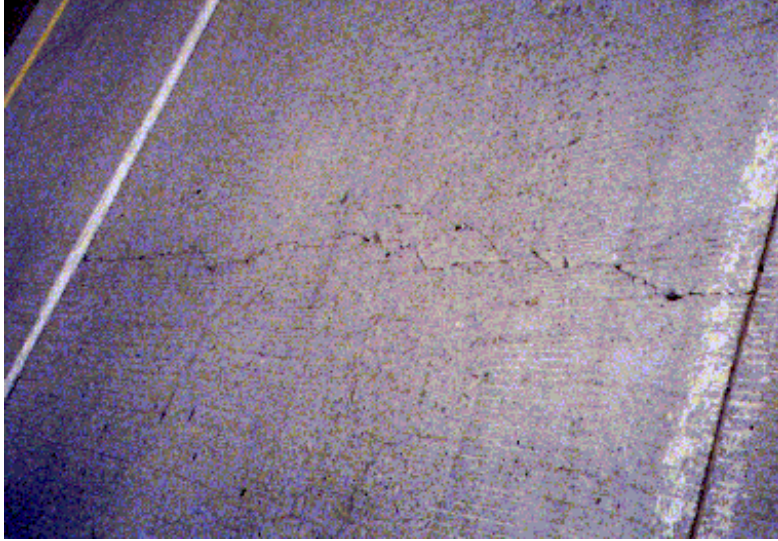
Full-width transverse cracking in test section (Winnemucca, NV).
